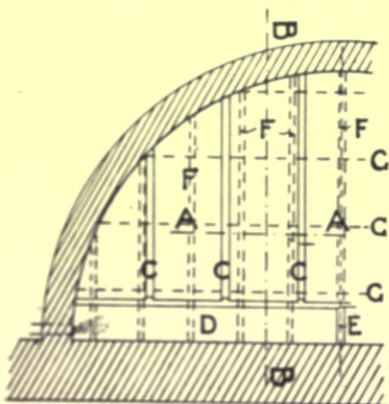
Half-plan of Lead Flat over Bay-window. C C, rolls; D, gutter; E, drip in gutter; F F, 9' x 2' tapering joists; G G, 3 1/2' x 5' purlins.
